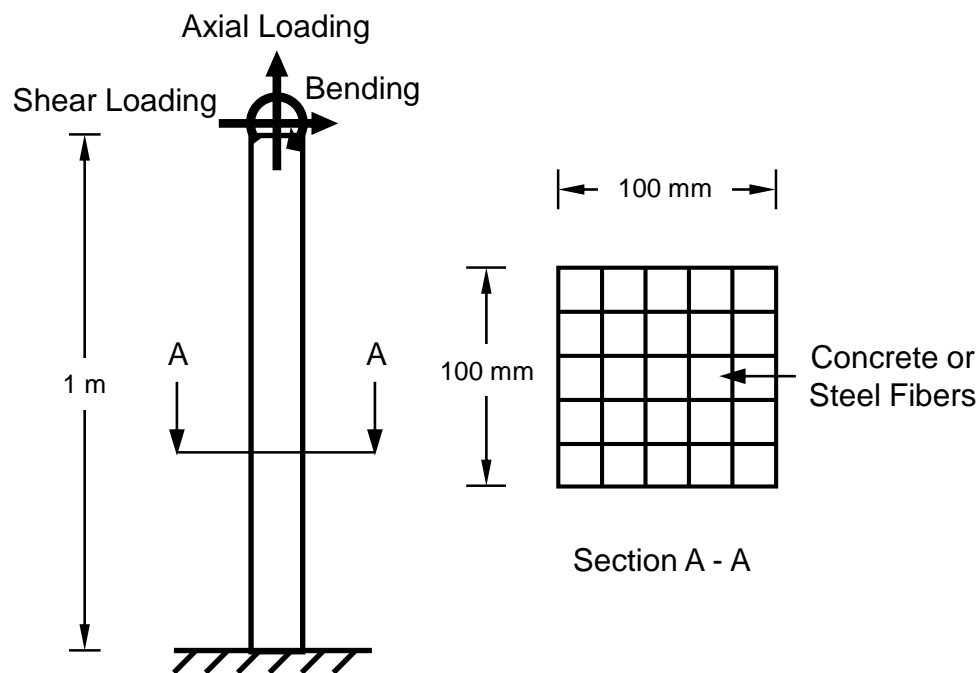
Schematic of the steel/plain-concrete column modeled with fiber sections and uniaxial steel/concrete materials.
